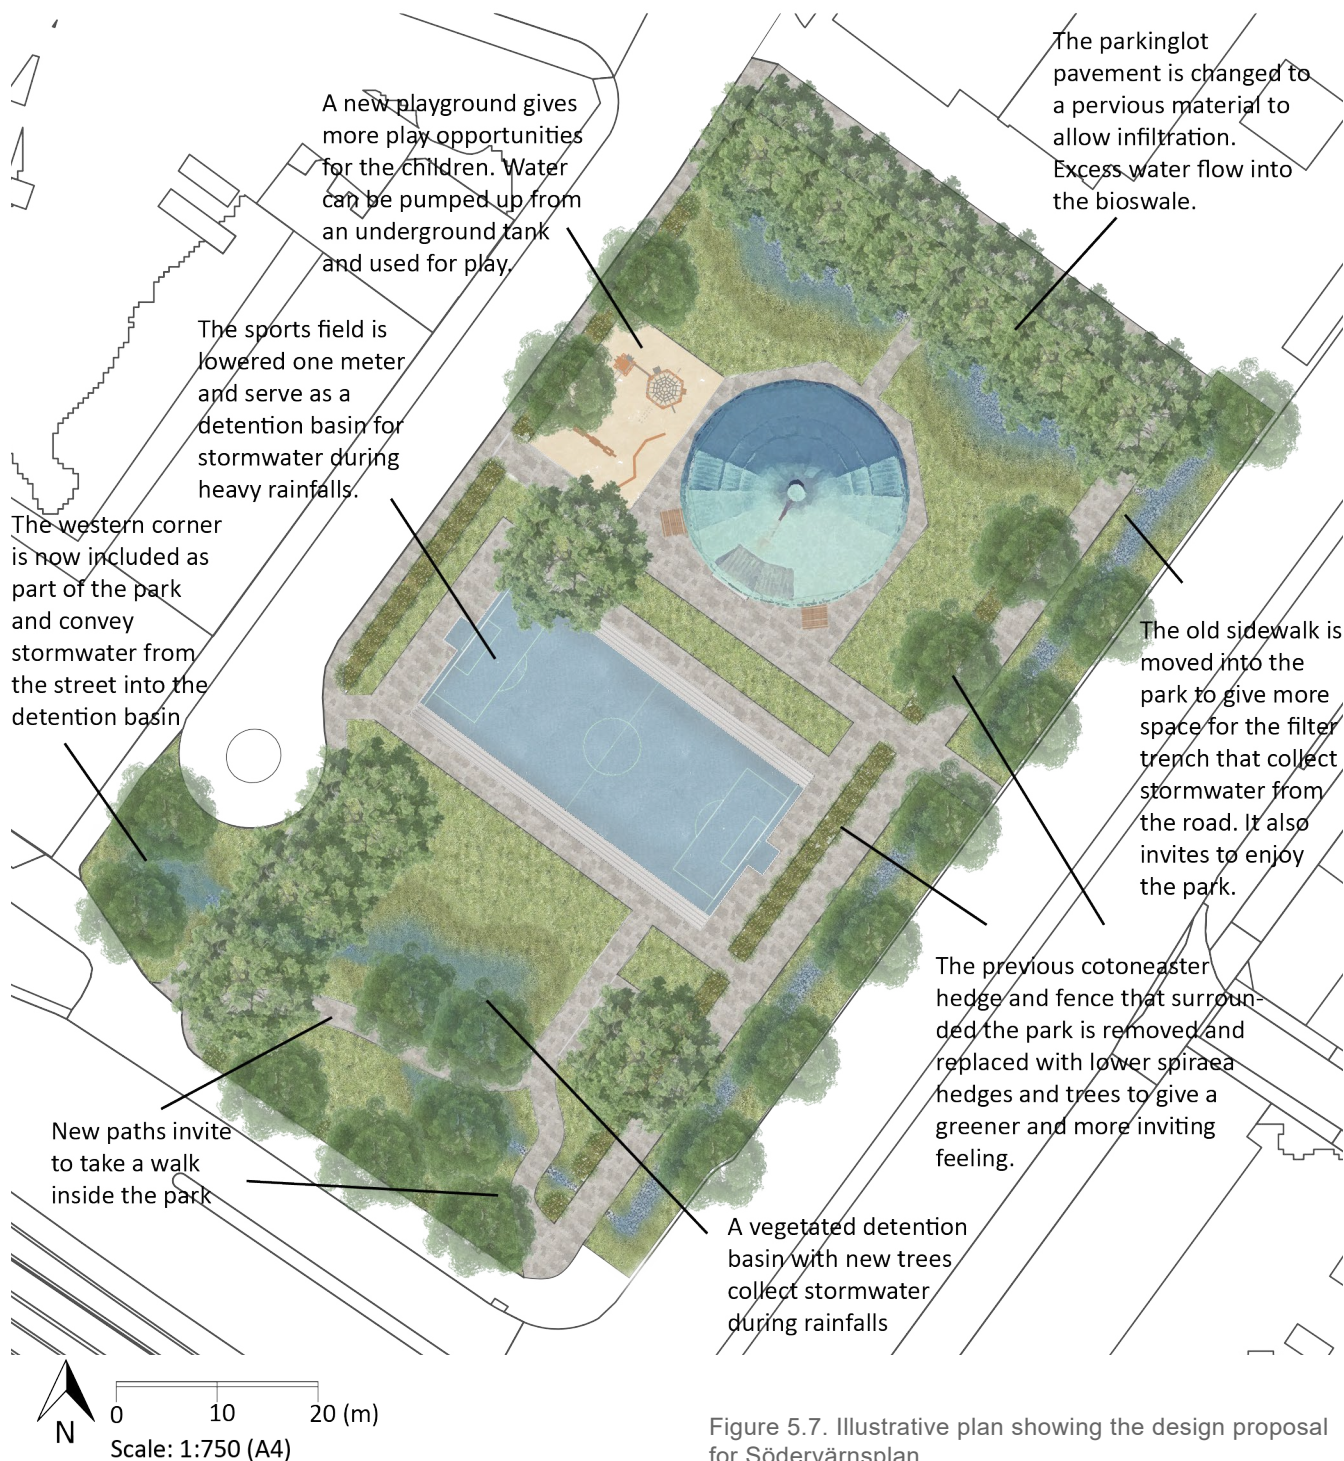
Illustrative plan showing the design proposal for Södervärnsplan.
